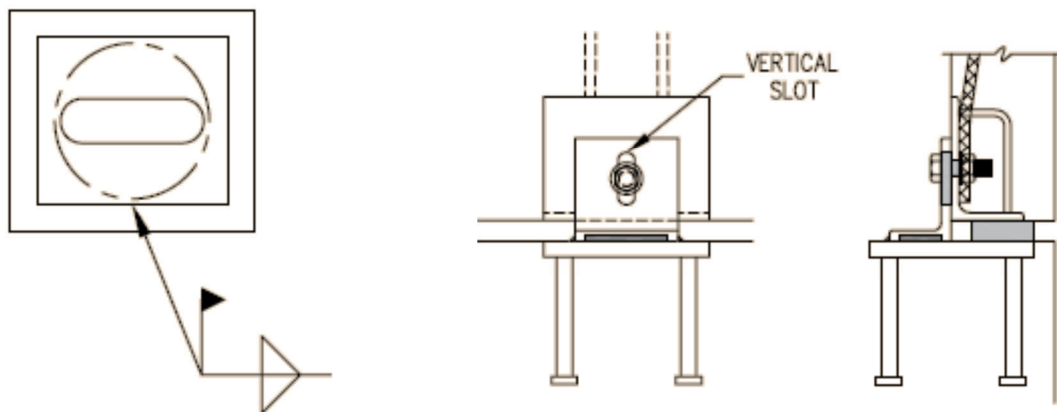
Welded tieback (WTB4).
